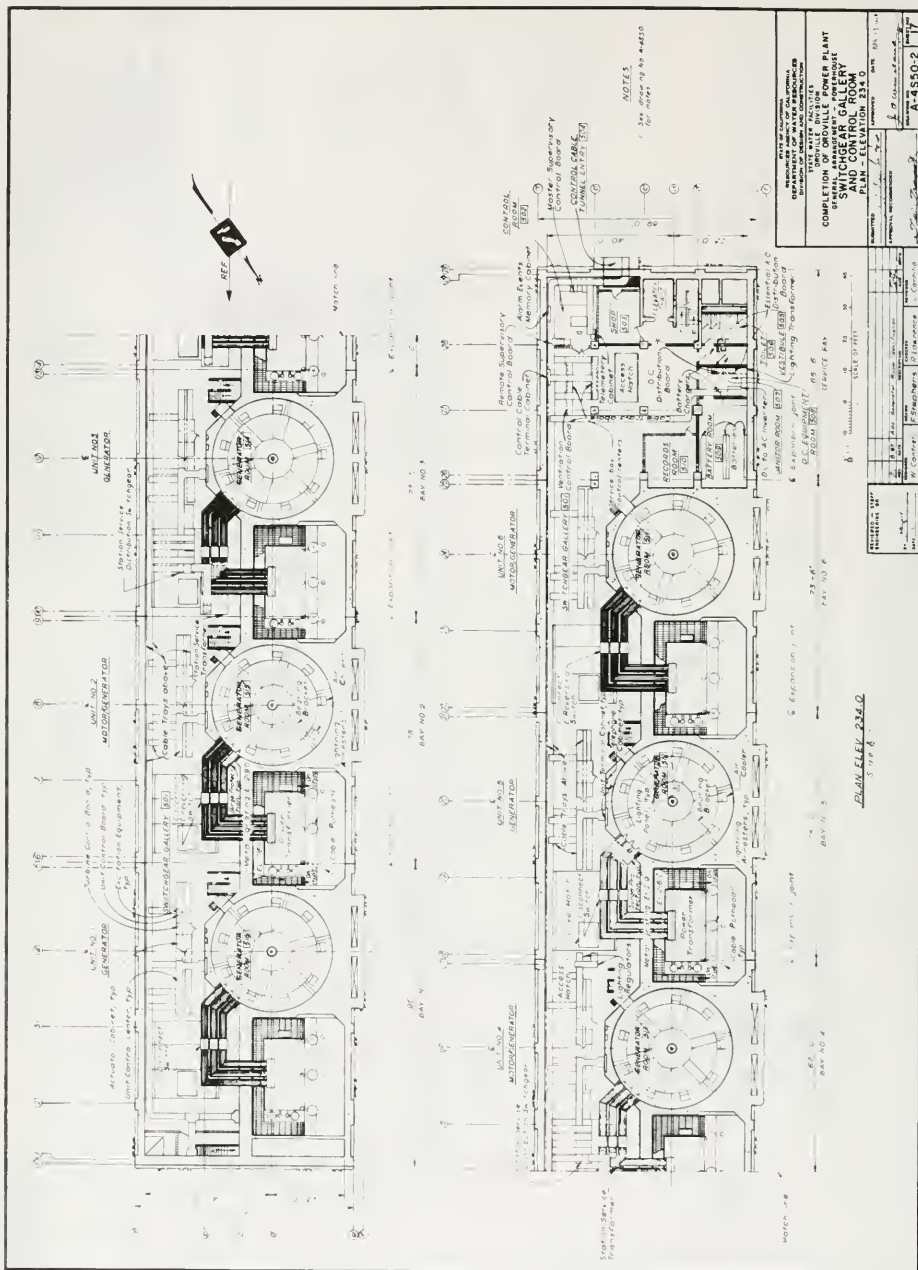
Switchgear Gallery—Plan—Elevation 234.0
